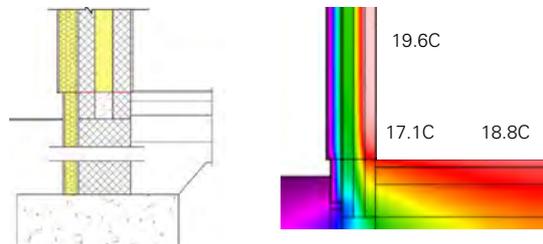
Ground Floor Details and Corresponding Thermal Models
